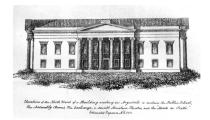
North Elevation of a Building to Contain a Public School, Assembly Rooms, an Exchange, a Small Theater and the *Monte di Pieta*, Argostoli
